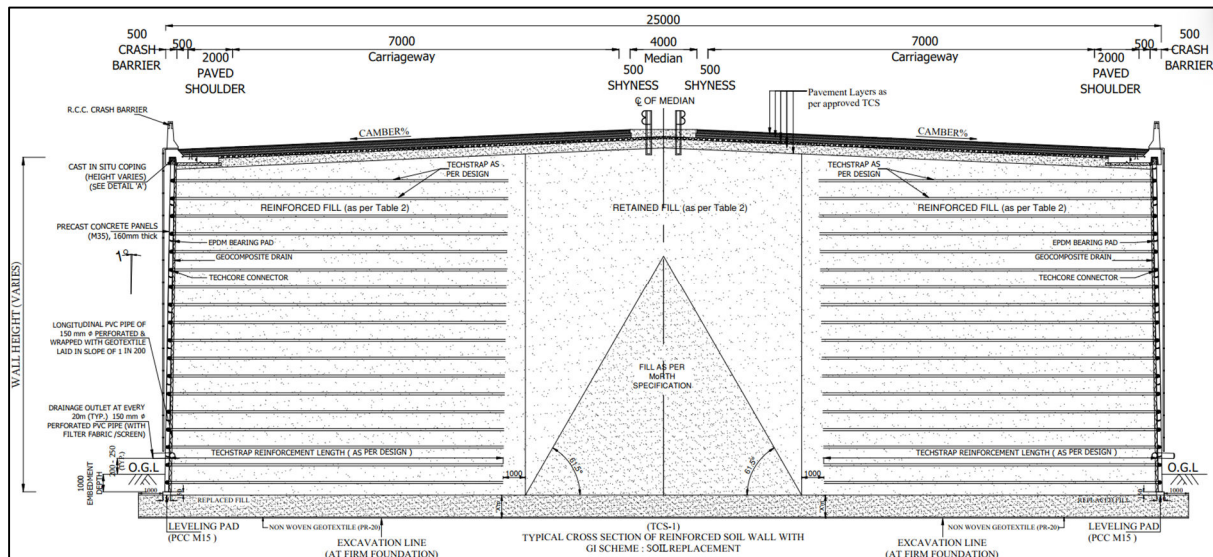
Typical cross-section of the reinforced soil wall, with soil replacement below BOL/EGL,
